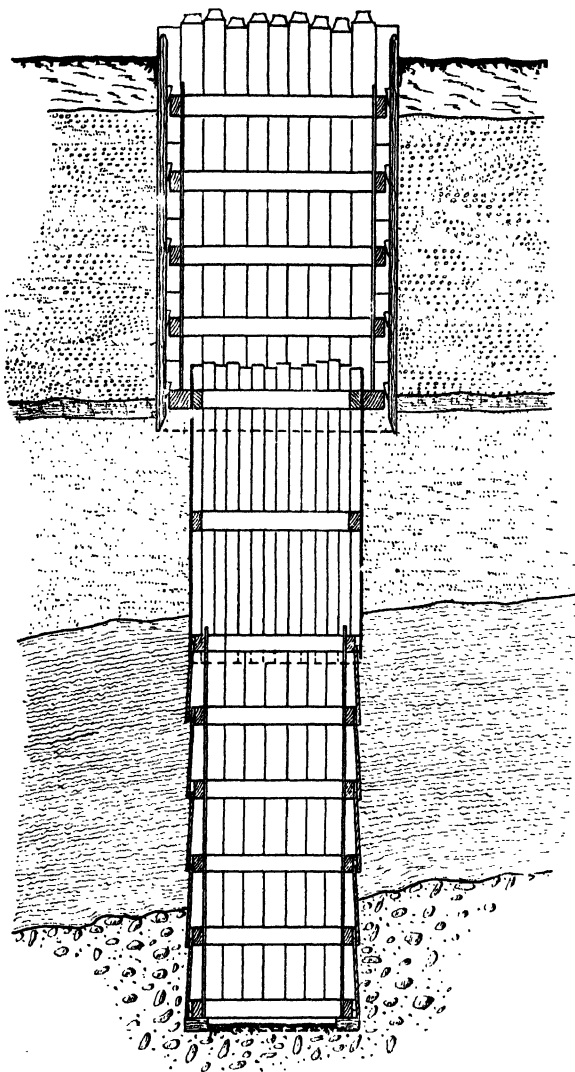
Test Pit, with Runners, Steel Piles, and Inclined Poling Boards.
